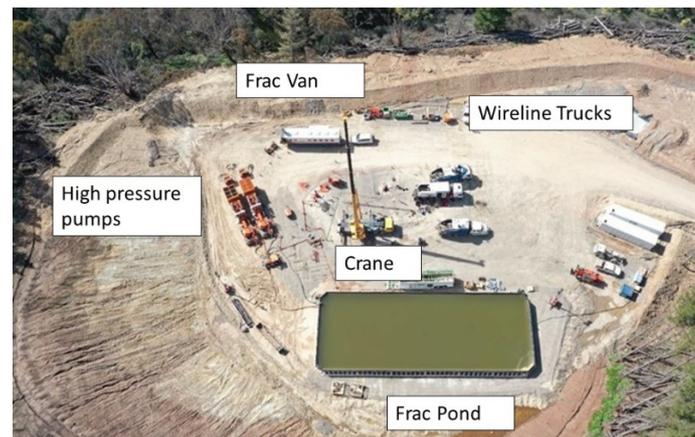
Aerial photo showing surface hydraulic fracturing layout with central crane
